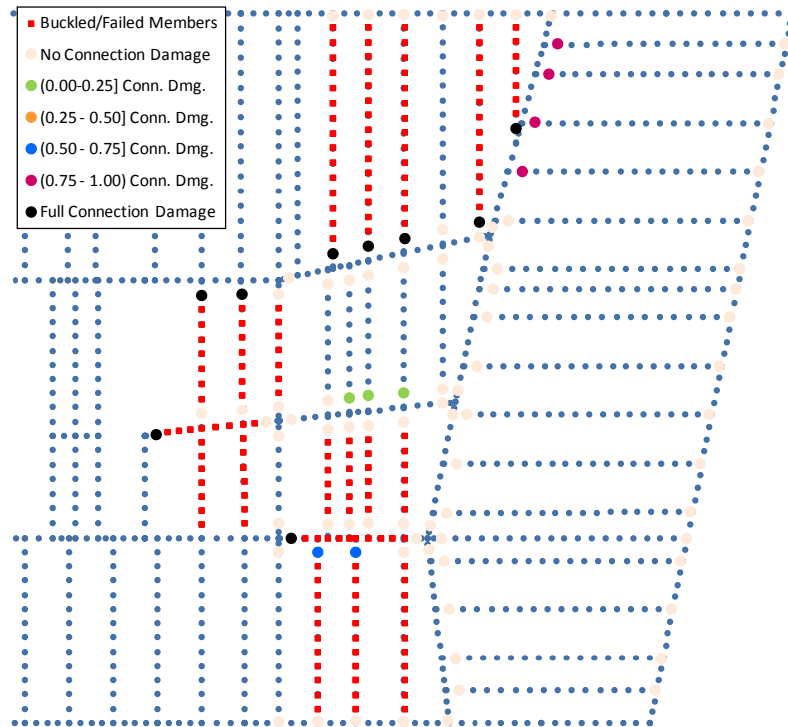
, Figure 11–28, and Figure 11–29 show the connection and floor framing damage that occurred in Floor 12, 13, and 14, primarily due to the effects of thermal expansion. The east beam-to-girder fin connections had a 0.75 to 0.99 damage level between the south face (Column 26) and Column 79 at most of the floor beams. This level of connection damage also extended toward the north face (Column 44) on Floor 13; only two connections remained undamaged. The seated connection at Column 79 had horizontal connection damage, with shear failure of all the erection bolts on Floor 13 and two to three bolts on Floors 12 and 14, respectively
